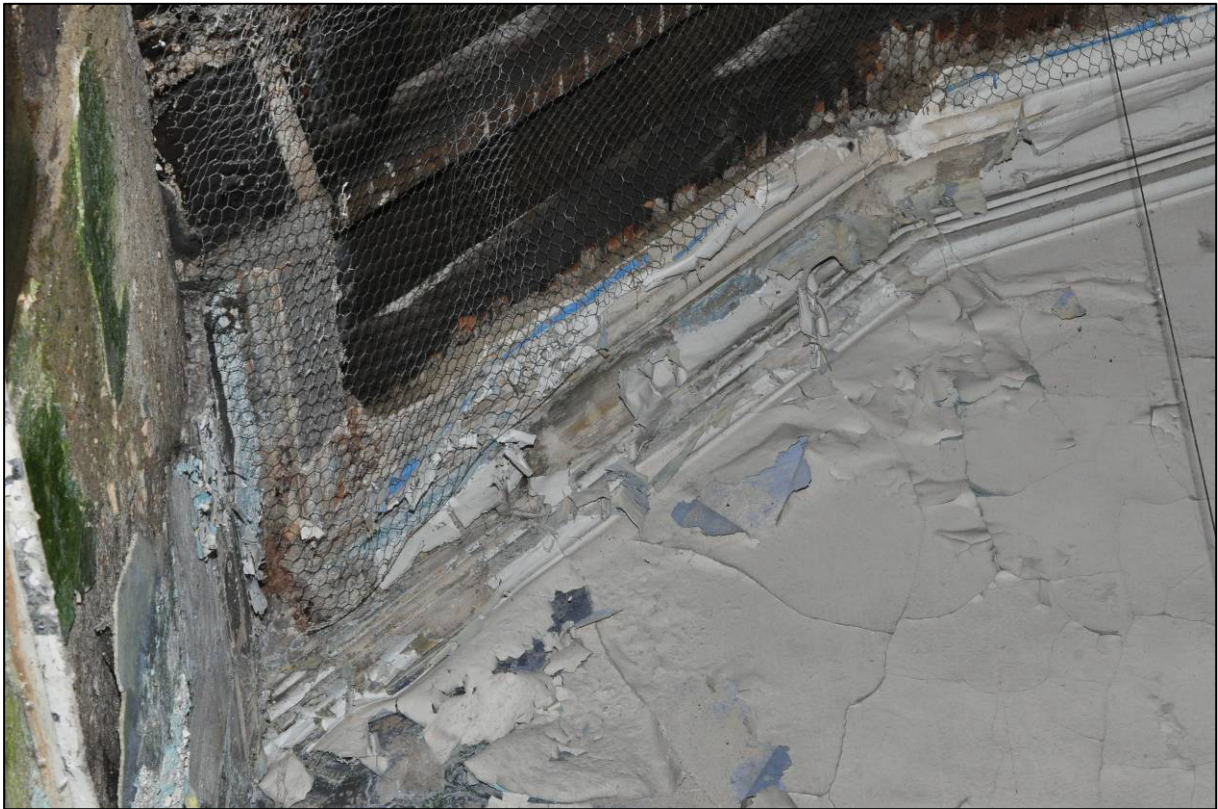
1879 Board School, science classroom (1F5), ceiling cornice, looking W (photo 2473).
